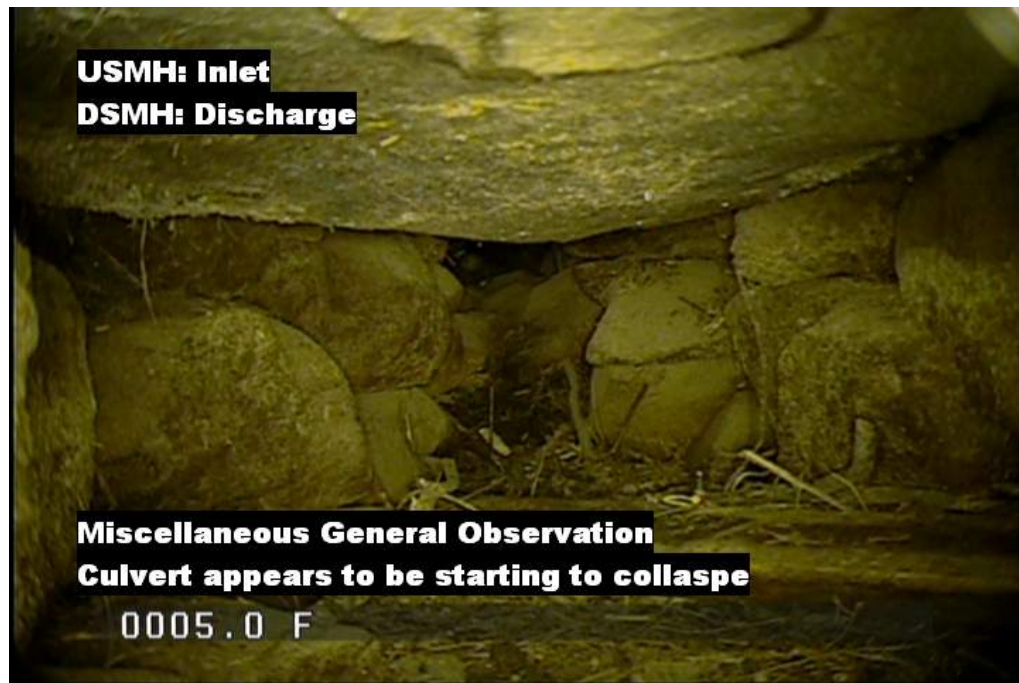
Parmenter Road culvert, interior collapse (CCTV)
